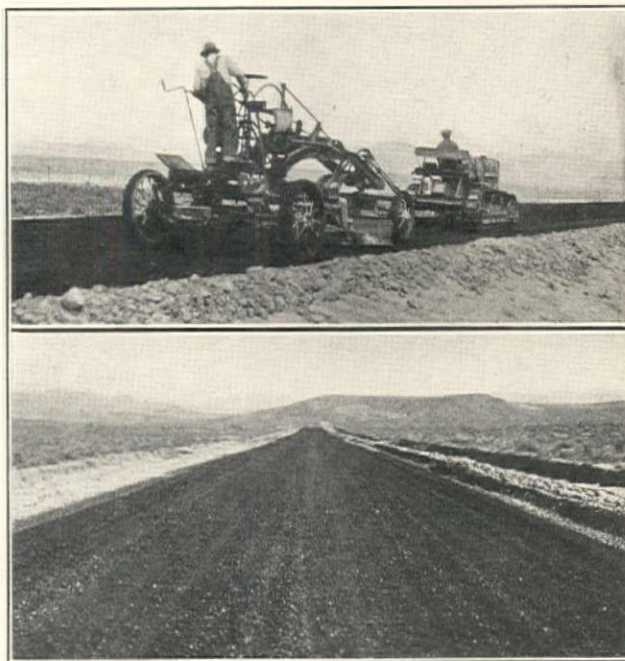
(Upper) Spreading and Blading Road-Oil Mix Behind Bituminous Road Mixer. (Lower) Completed Road, Except That Shoulders Have Not Been Built
